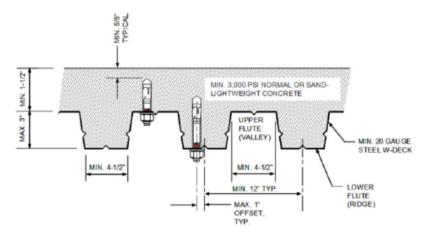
A-INSTALLATION IN THE SOFFIT OF CONCRETE OVER METAL DECK FLOOR AND ROOF ASSEMBLIES1
